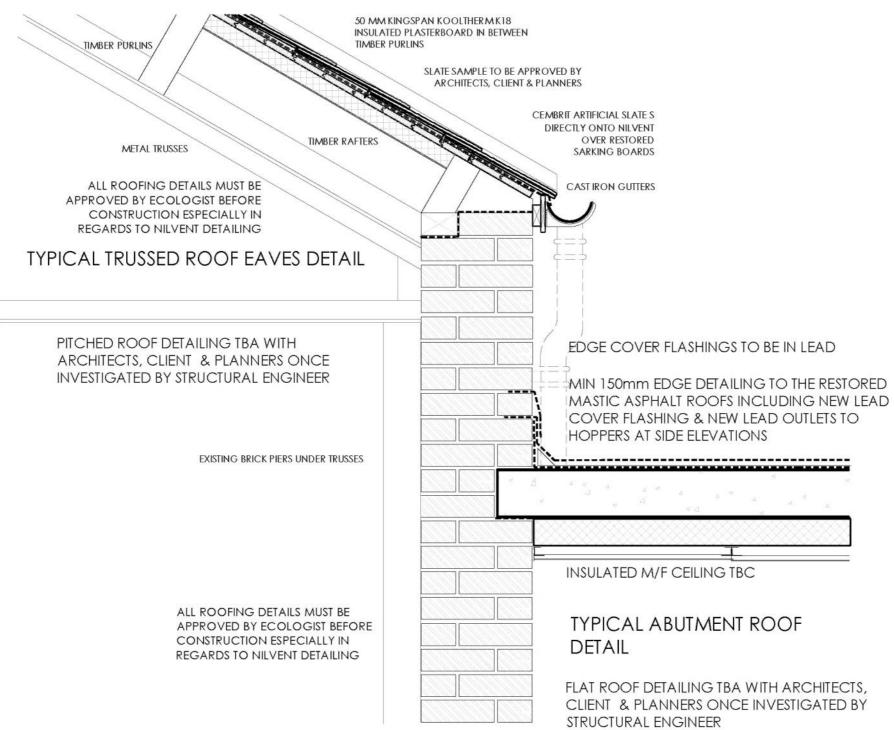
Proposed detail for junction of pitched roof with flat roofs
